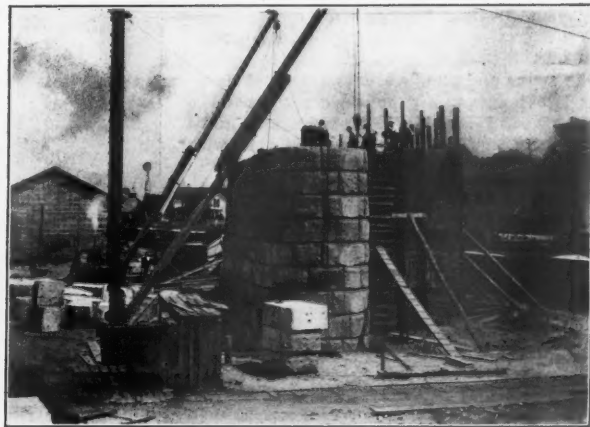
Pier 1 and Adjoining Concrete Buttress During Construction.
